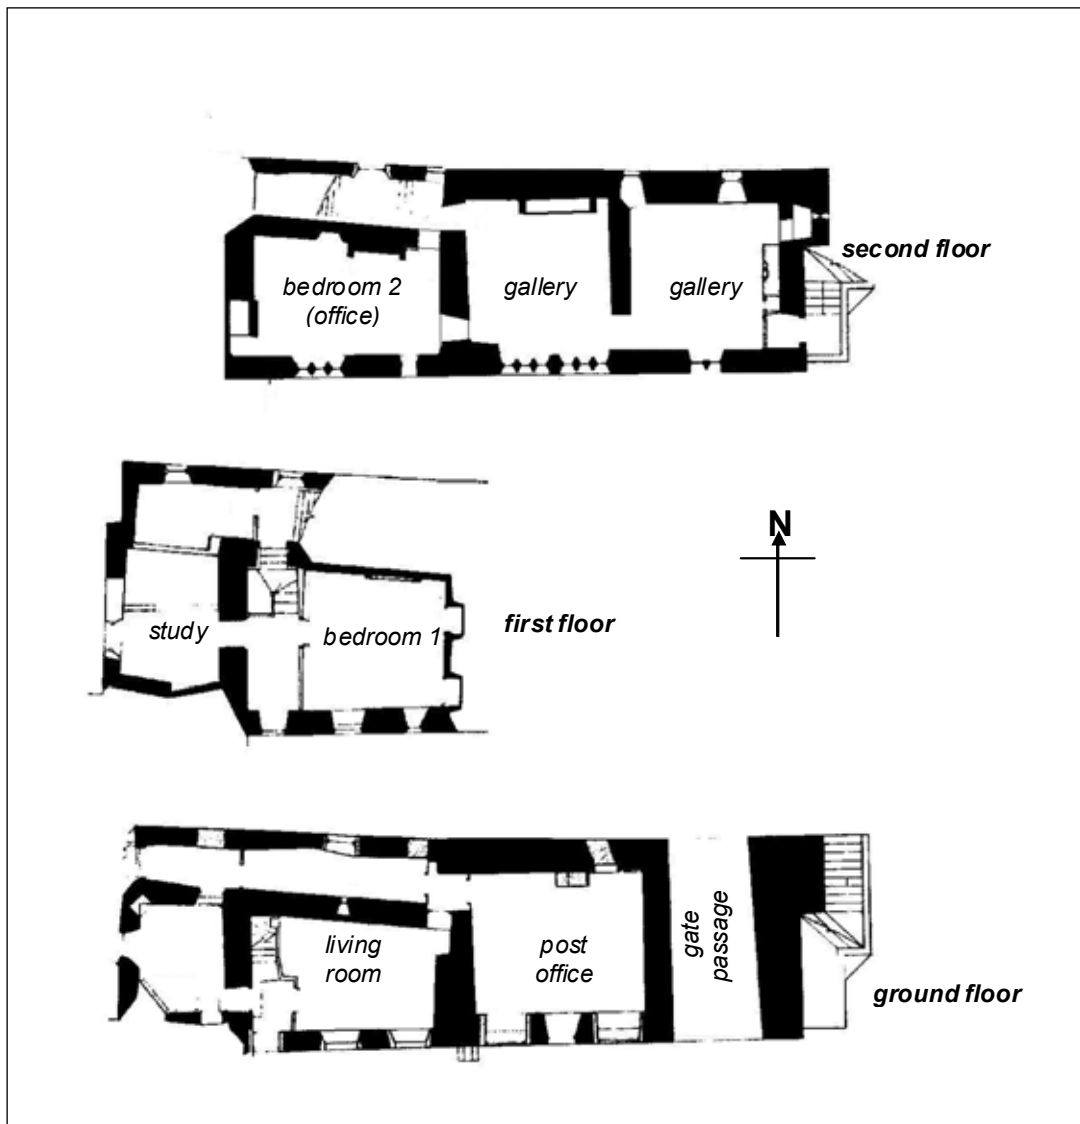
Plan to show layout and arrangement of the gatehouse and No 1 The Square (after Kevin Doonan, Architects)
